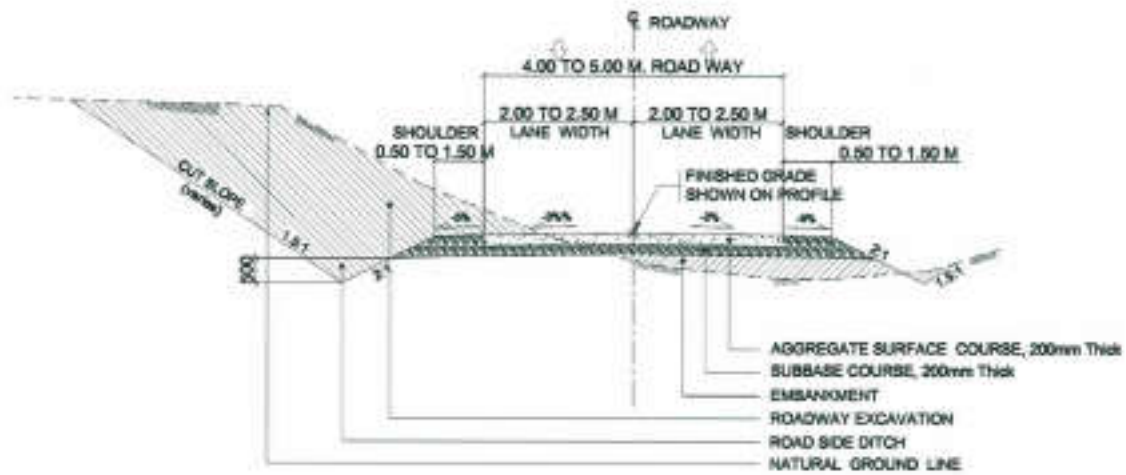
TYPICAL ROADWAY CROSS-SECTION FOR ROAD OPENING
